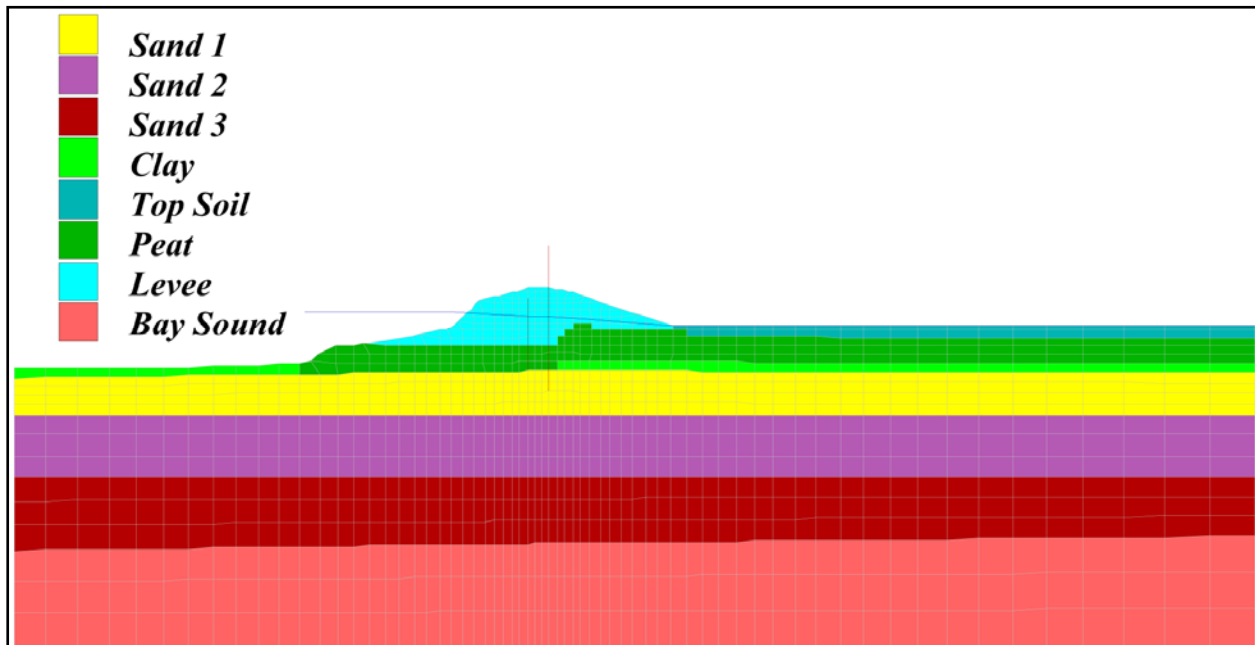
Soil zones, levee wall and sheet piles at normal pool for London north breach sta. 14+00
